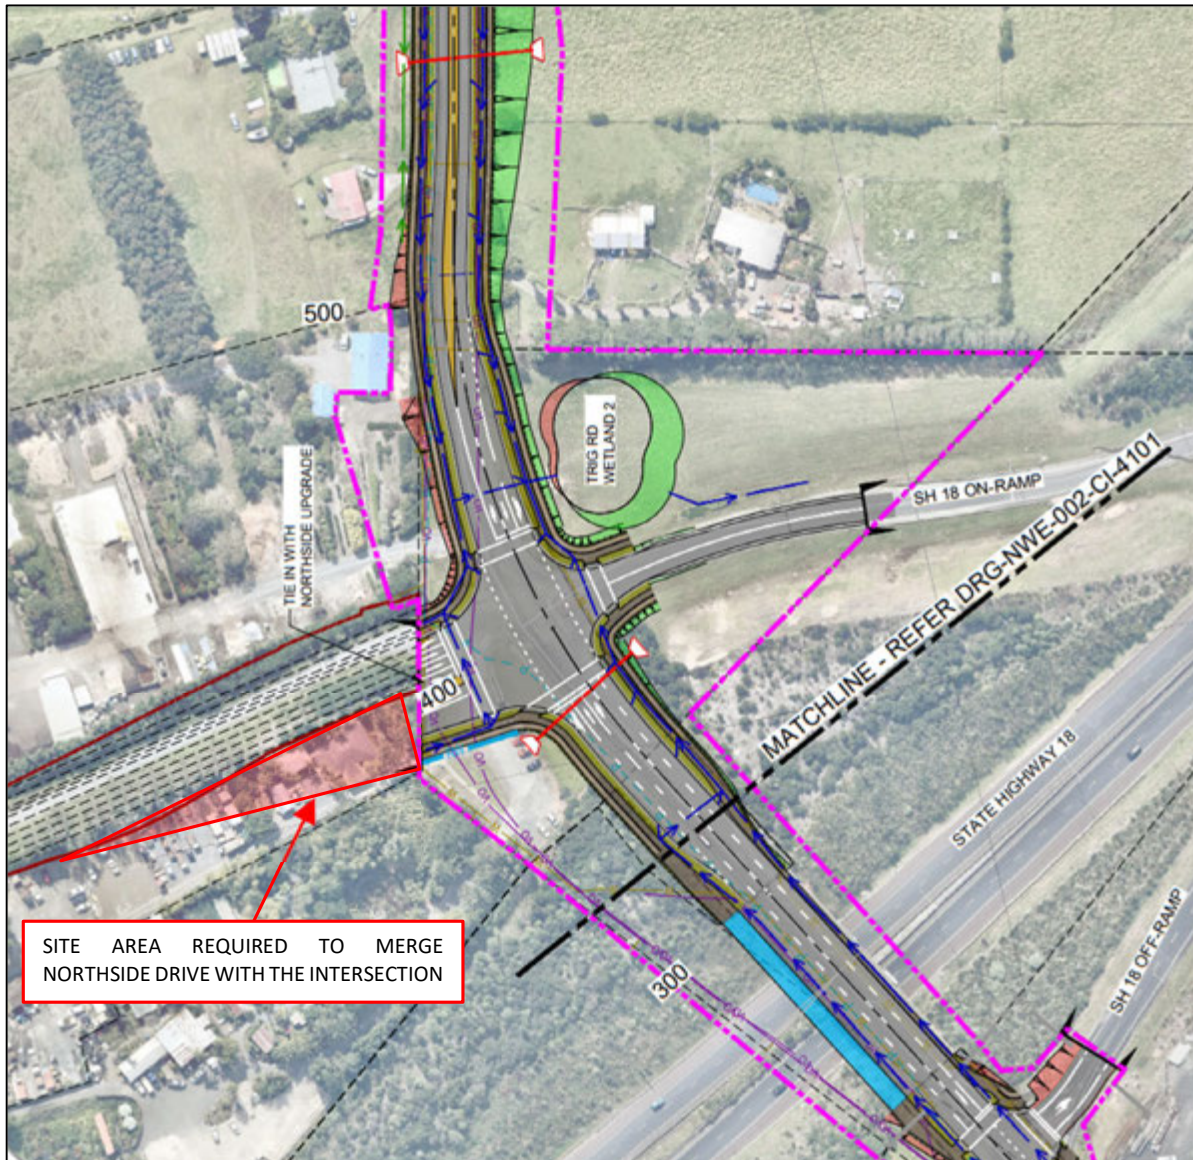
Trig Road Upgrade General Arrangement Layout Plan
